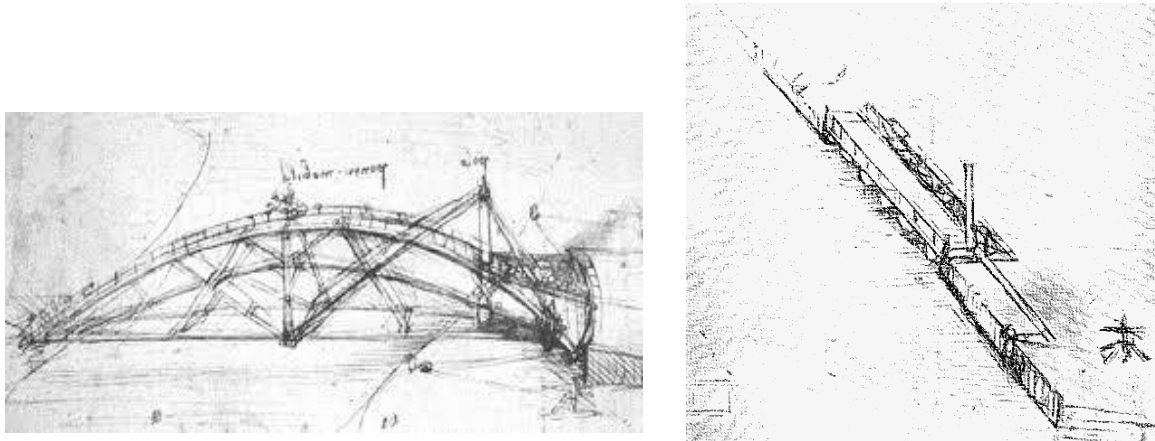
Da Vinci sketch of Swing Bridges (Hovey, 1926)
